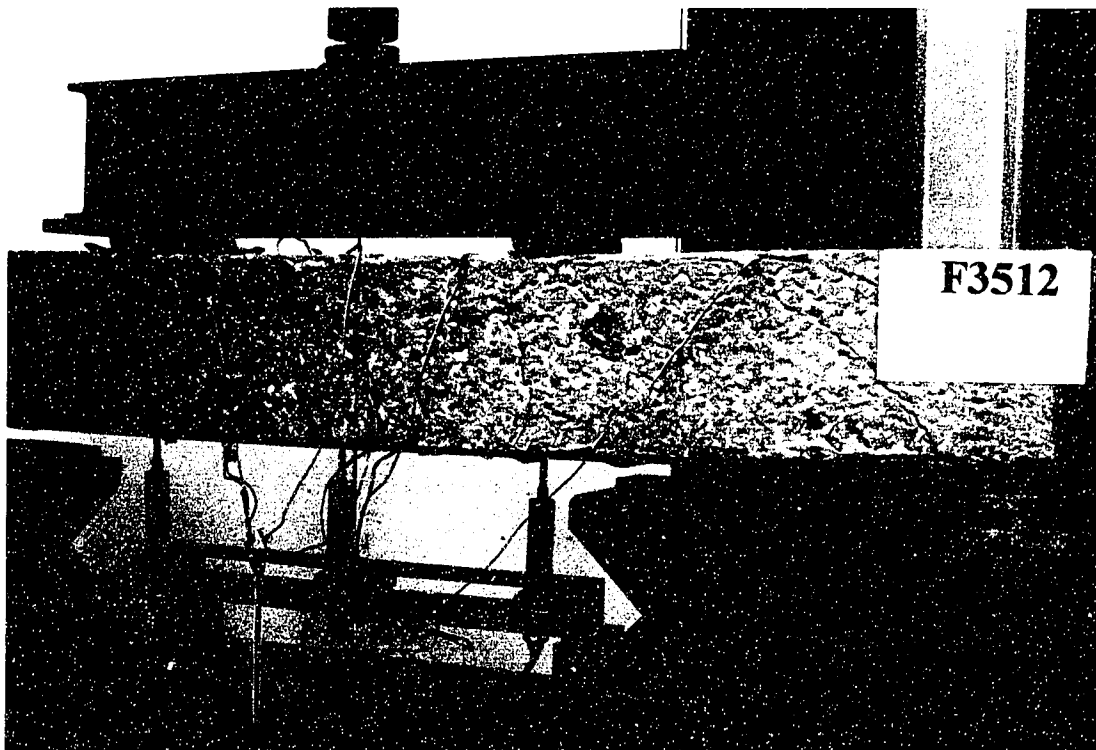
Photograph showing the mode of failure for beam F3512 strengthened by 3 mm thick, 100 mm wide and 1100 mm long plate with 120 mm c/c spacing of stirrups
